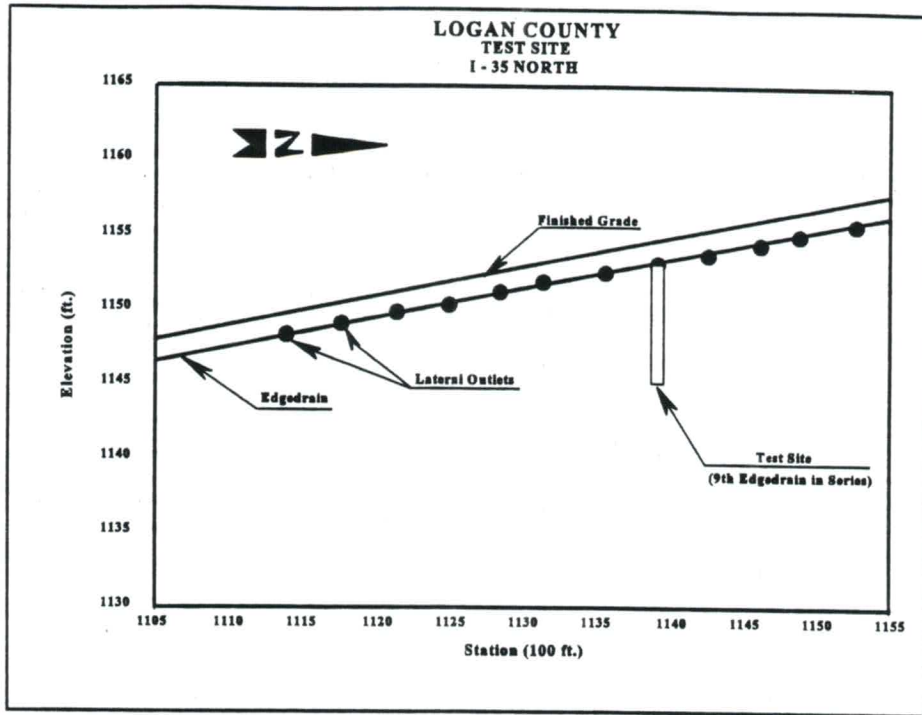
Longitudinal slope of the roadway at the Logan county site
